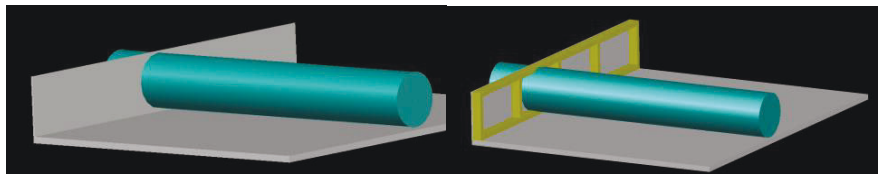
Duct penetrating the vertical wall of a suspended ceiling. 4a shows as-designed solution. 4b shows the supporting structures needed for installing the ceiling. In 4b the duct does not fit between the horizontal structures.
